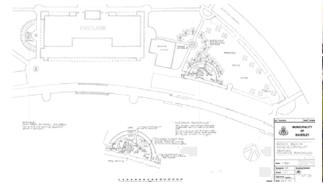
Proposed landscaping to the south of the Pavilion, 1982. The brick wall at the bottom of the plan is noted as existing. Source: WLS Engineers Plan 5928
